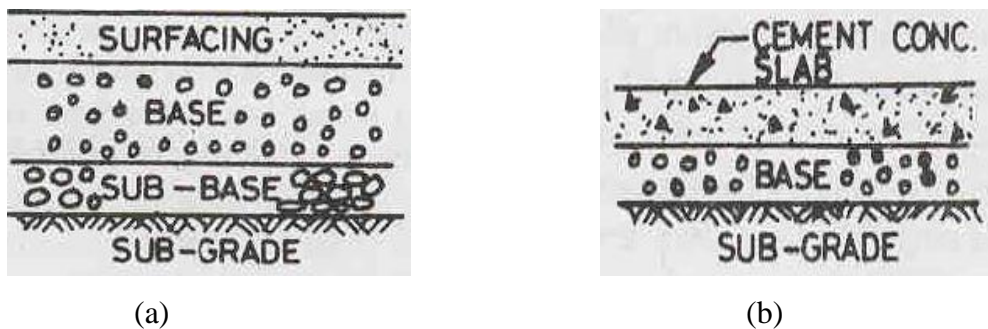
(a) Flexible Pavement (Source: ARORA) (b) Rigid Pavement (Source: ARORA)
